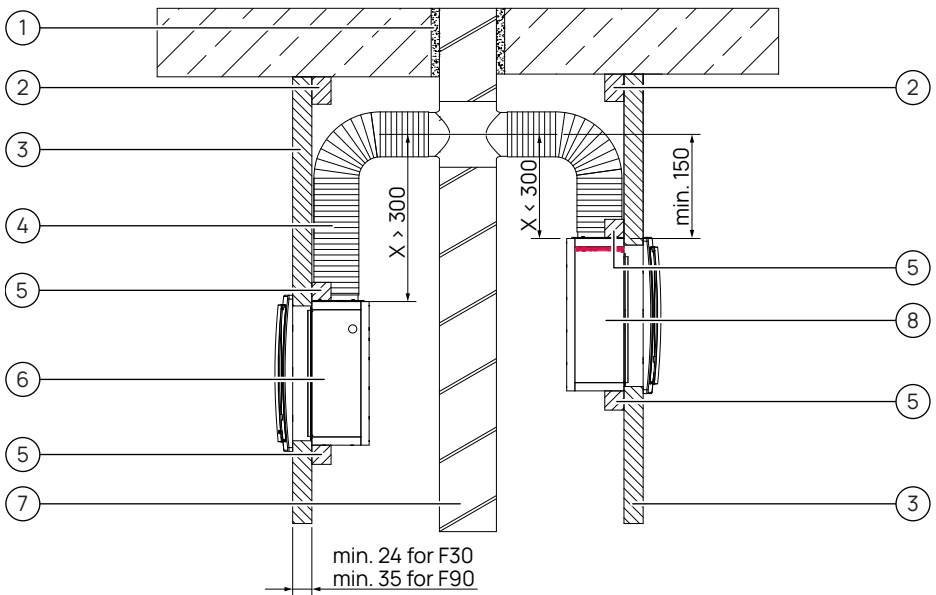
Cutaway drawing – wall structure with BS and BSS fire protection designs
